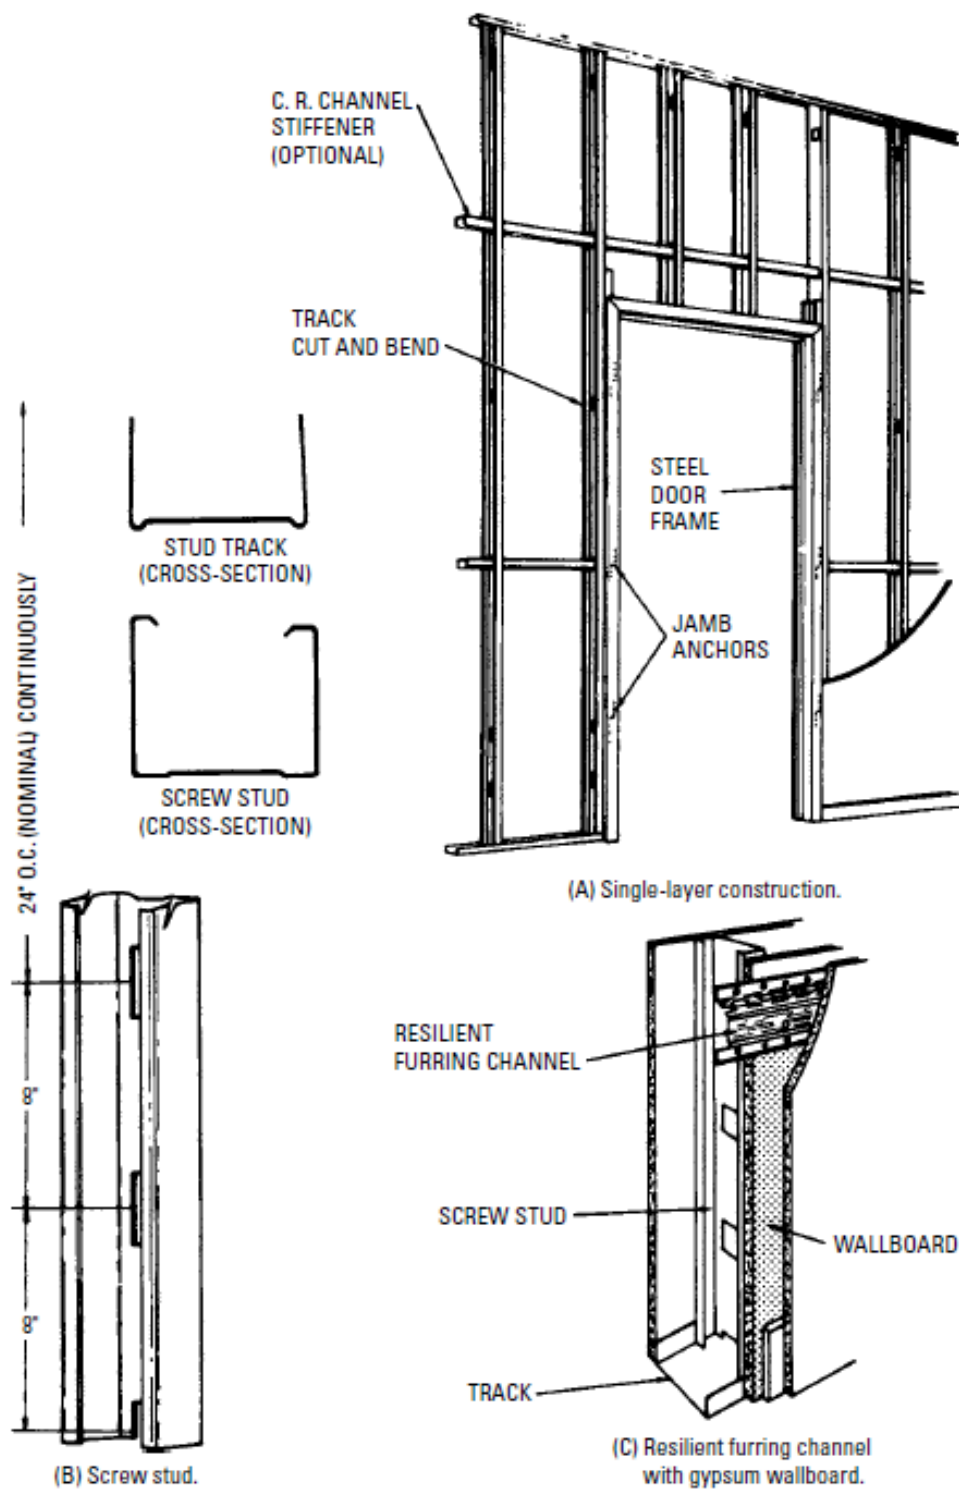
Details of metal wall construction using metal studs and tracks.
